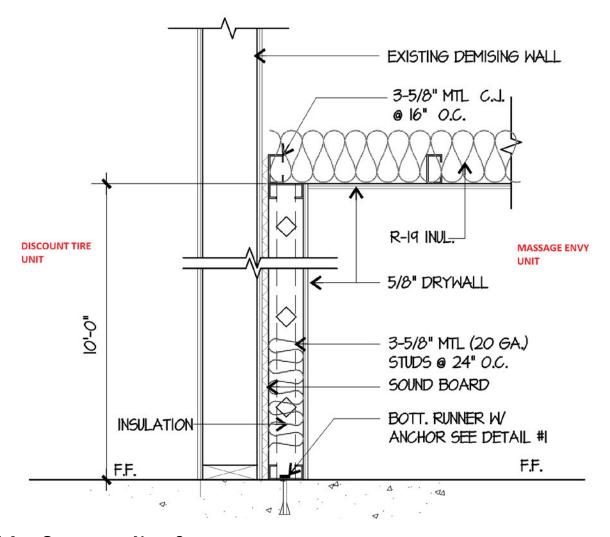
A: EXISTING DEMISING WALL DETAIL
